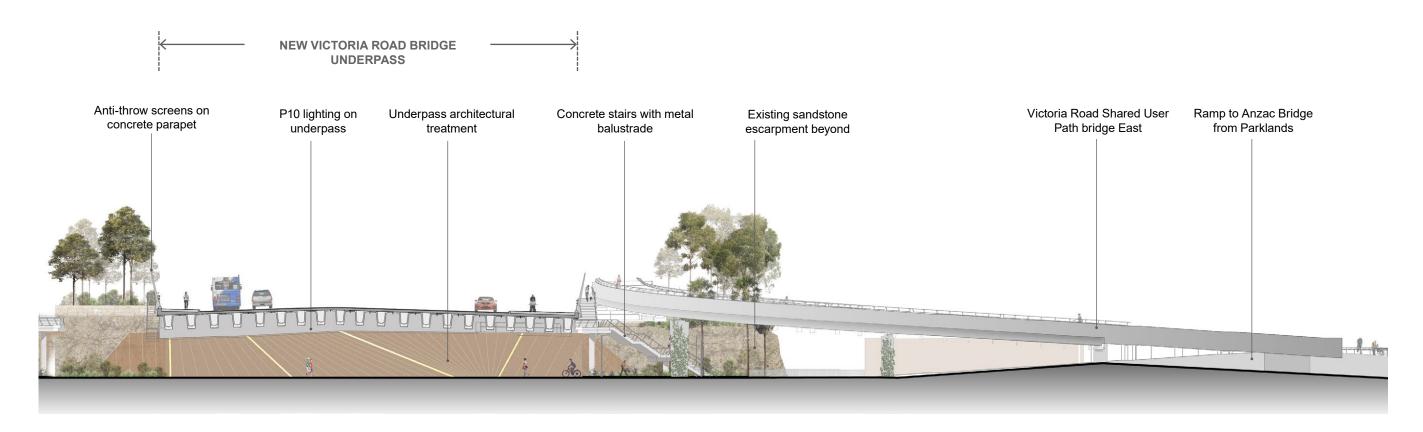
New Victoria Road Bridge, stairs to Victoria Road and Victoria Road Shared User Path Bridge (east) - Elevation
